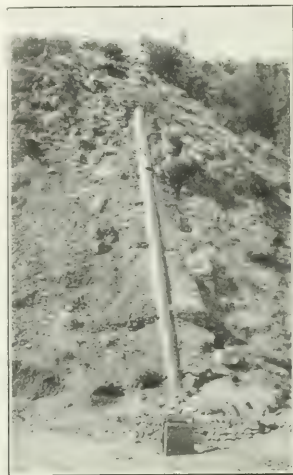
Syphon from Low Point Towards Tunnel No. 7.
